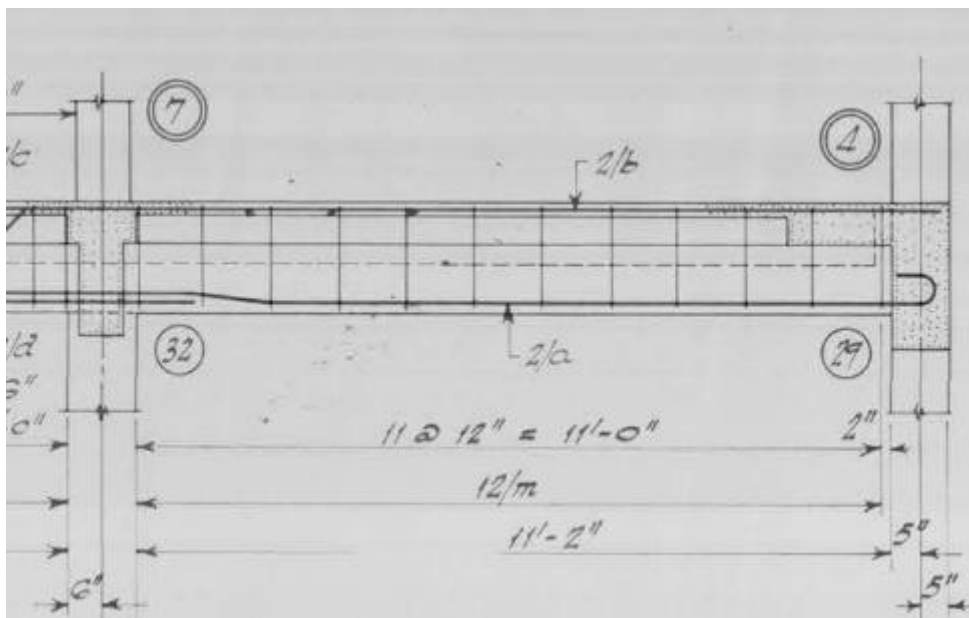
Typical Section Through Beam-Column Connection Noting Continuous Reinforcement Through Column Positions.
